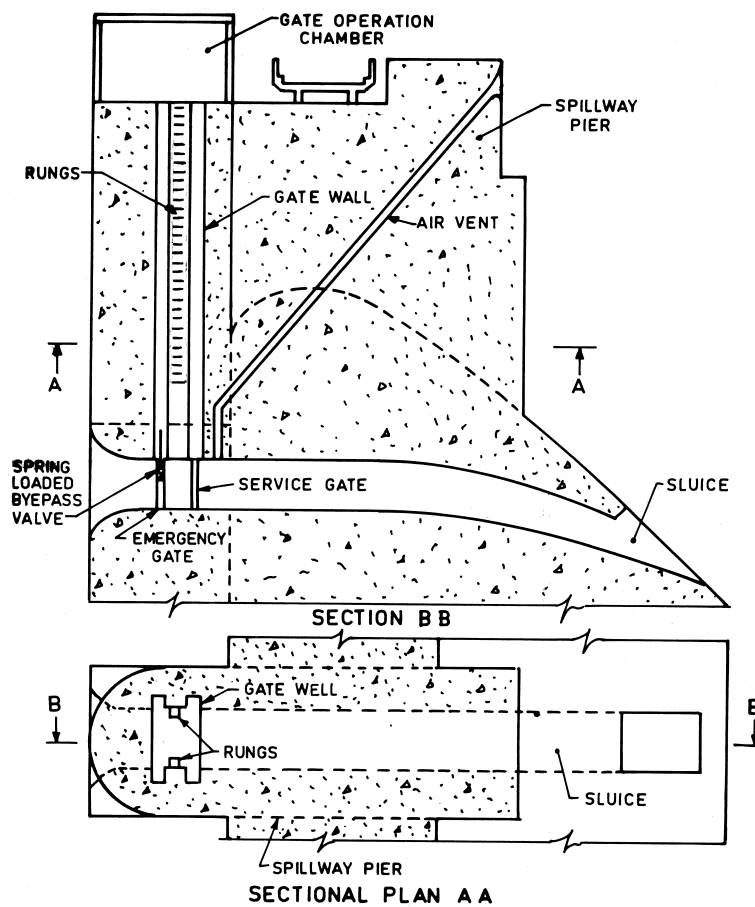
TYPICAL DETAILS OF SLUICE LOCATED IN THICK SPILLWAY PIER
